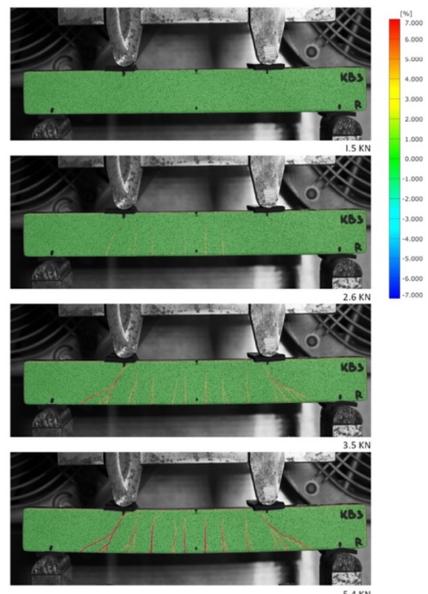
Major strain in BK<sub>43</sub> beam specimen shown under 1.5 kN, 2.6 kN, 3.5kN and 5.4kN loading. First, vertical tension cracks appear, followed by diagonal shear cracks that eventually lead to failure. The vertical cracks are arrested towards the top, compression zone of the beam.
